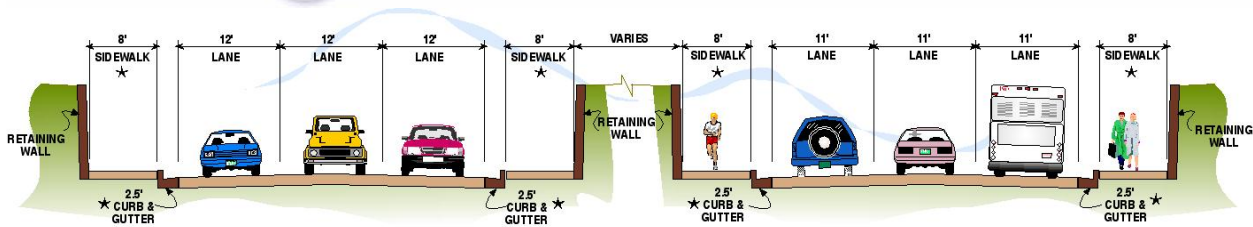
Preferred Alternative, Santa Fe Drive and Kalamath Street Typical Section
